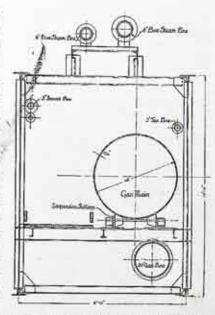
Section of Bridge Showing Bearing of 48-in. Pipe on the Expansion Rollers.
